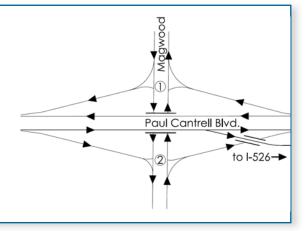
Paul Cantrell Boulevard at Magwood Drive Alternative 2
